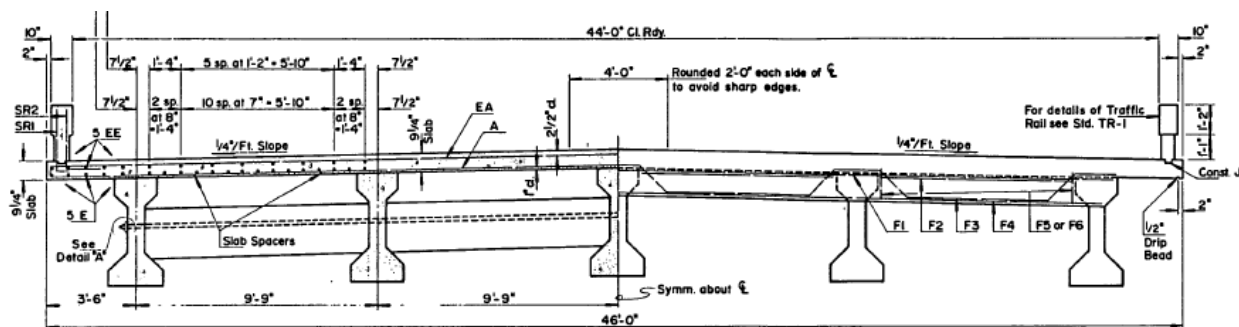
Cross-section view of U.S. 183/412 over Wolf Creek bridge
